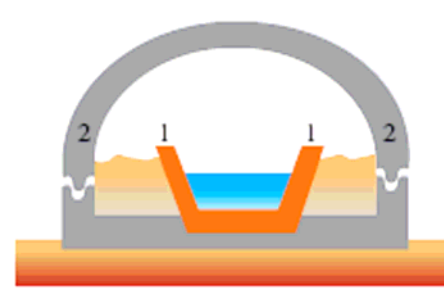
Precast unit allowing ledges and dry-standing areas to be built. Void between (1) and (2) is backfilled or concreted to restore bank continuity.
